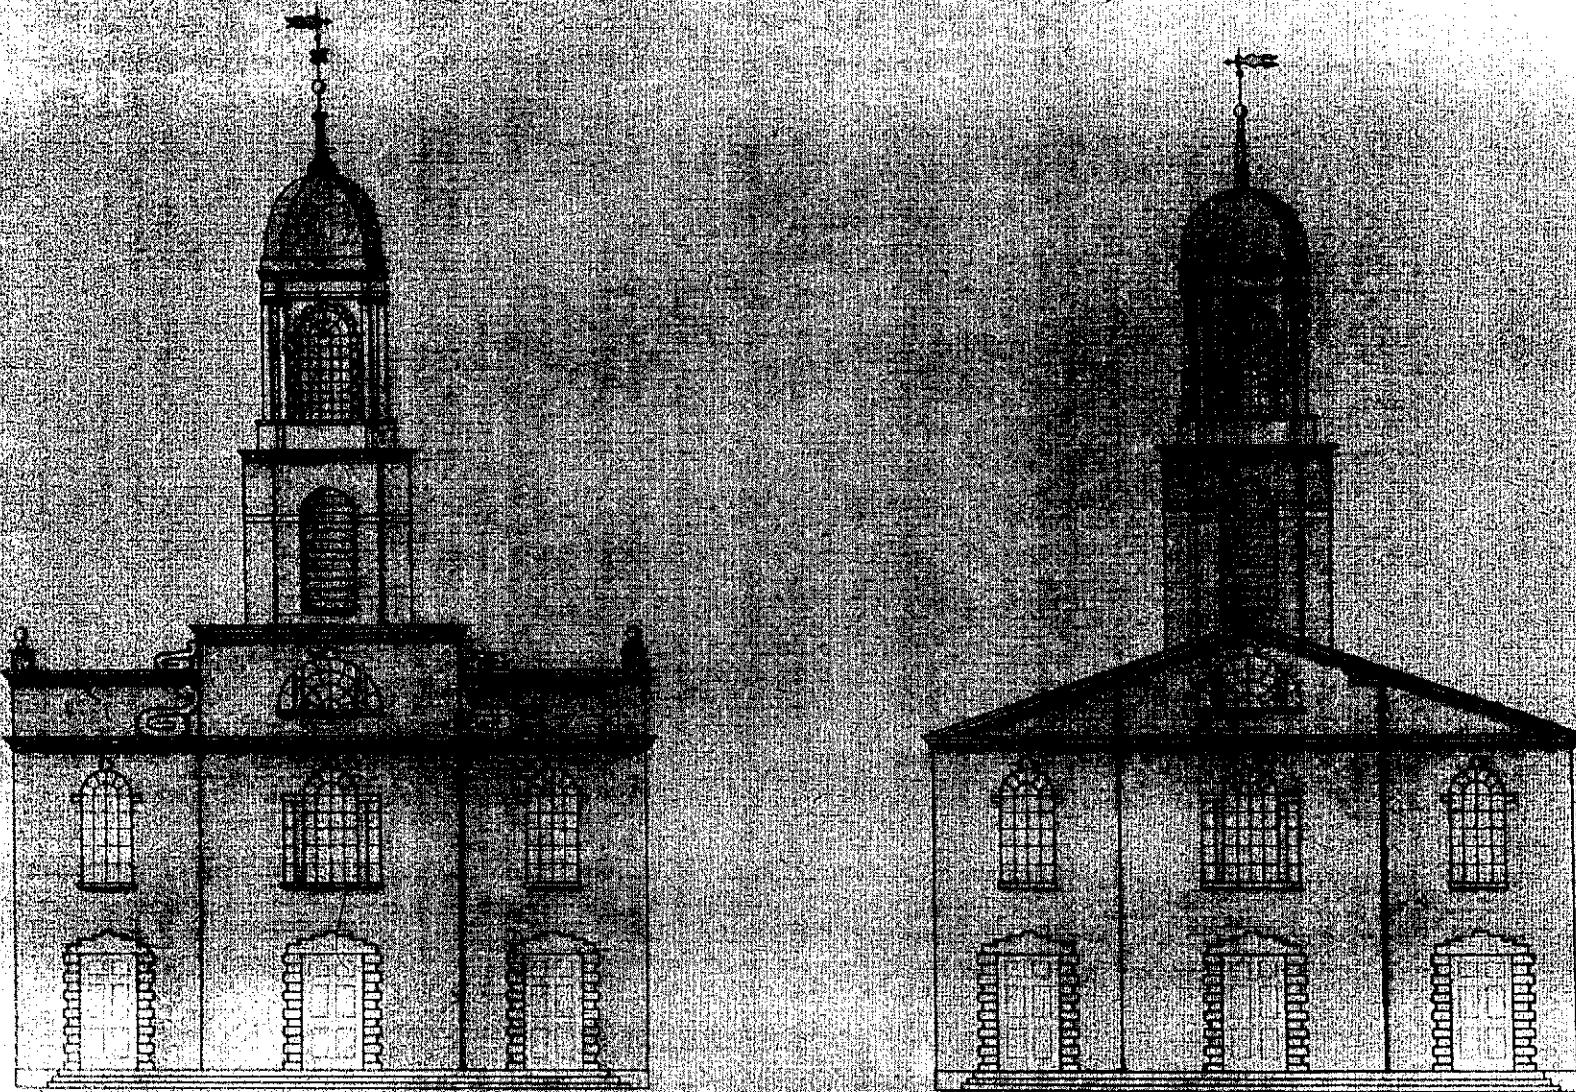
Front (east) elevation of St. John's Church as it originally appeared (left) and as it appears today (right). Drawing by the author.
